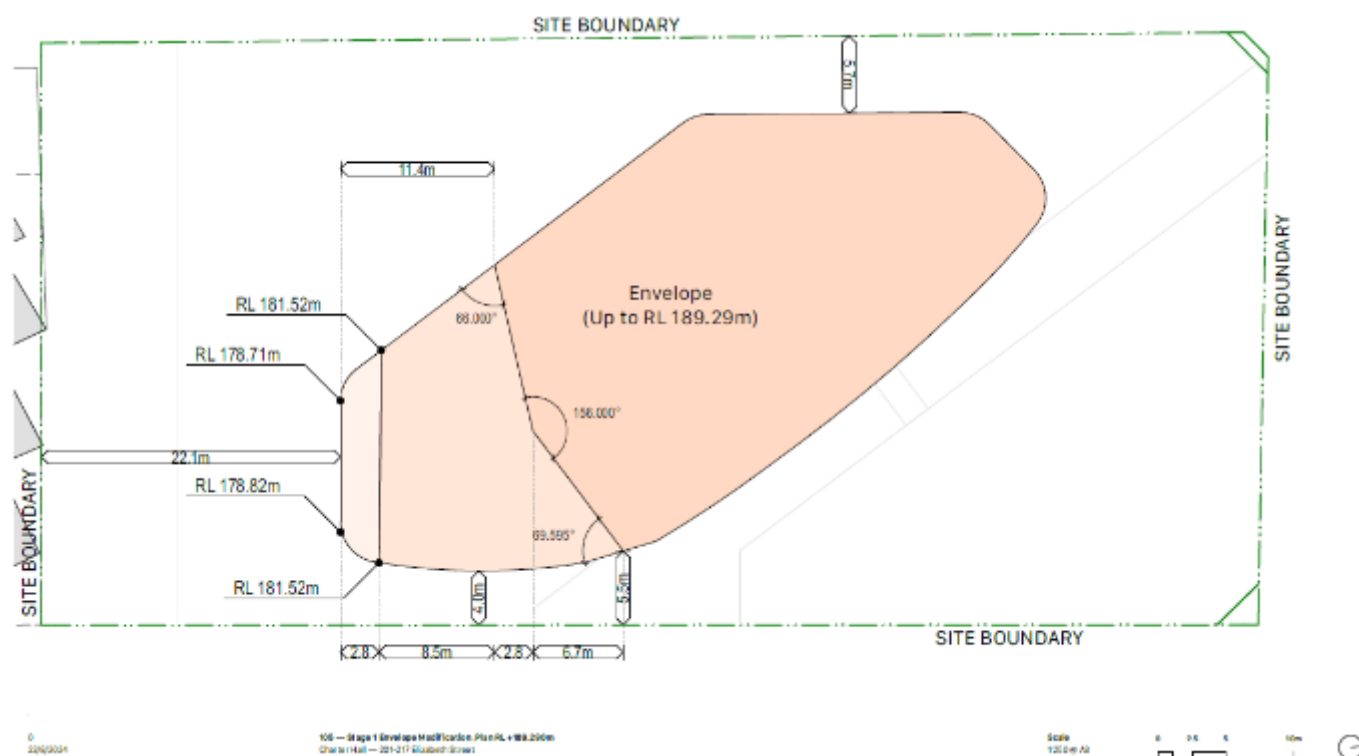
| Proposed high-rise tower (up to RL 189.290) (Source: Ethos Urban modification plans)
